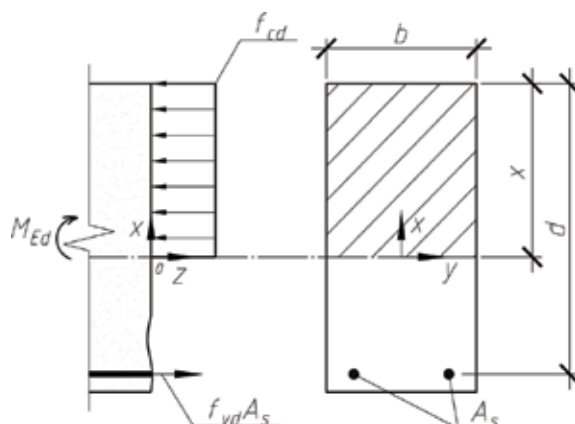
Scheme of forces in the cross section of bending reinforced concrete element for single reinforcement.
